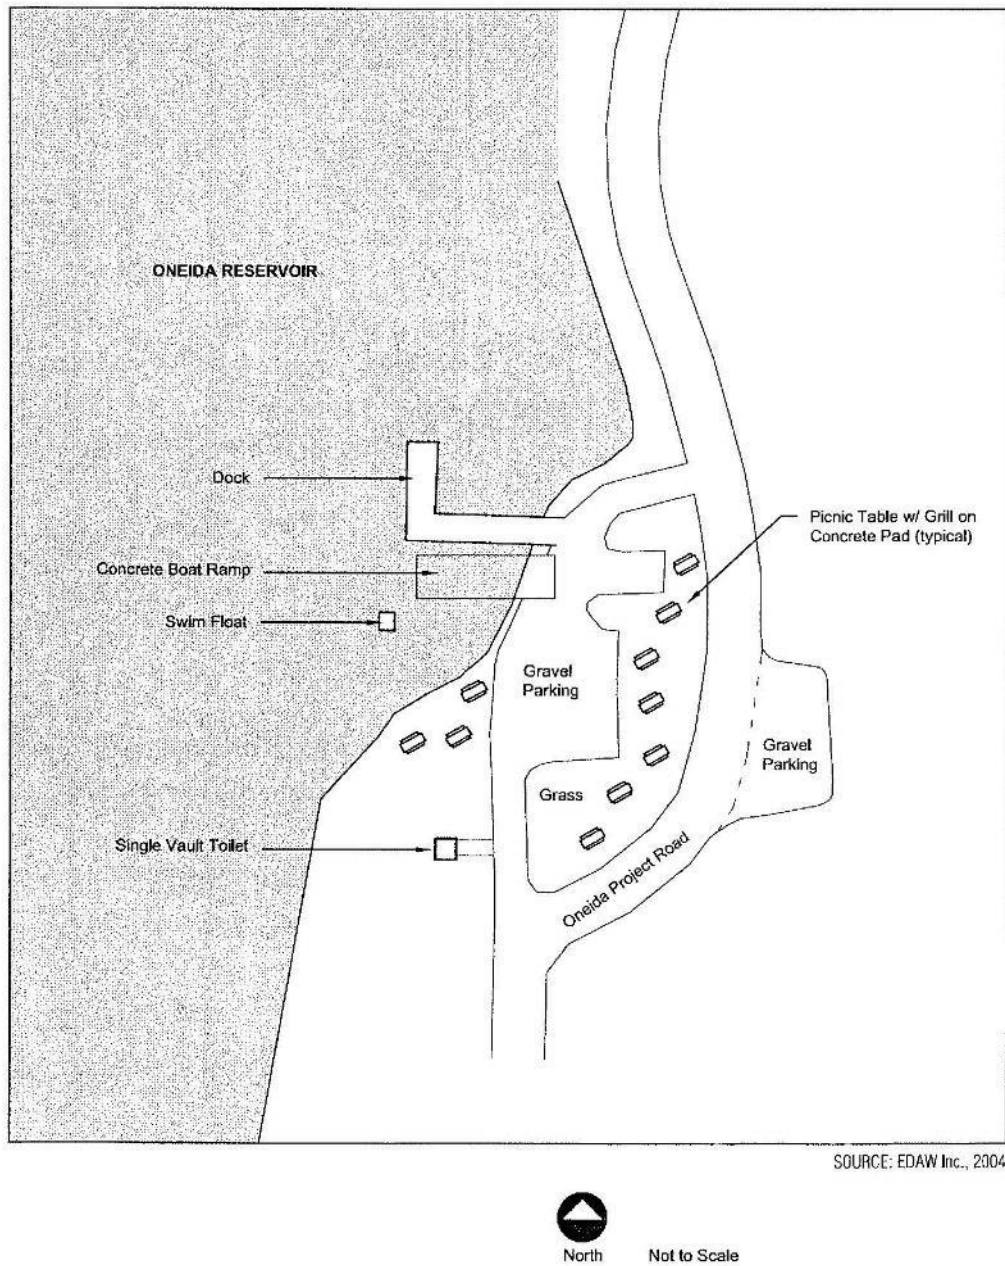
Site plan of the Oneida Day Use Area.
